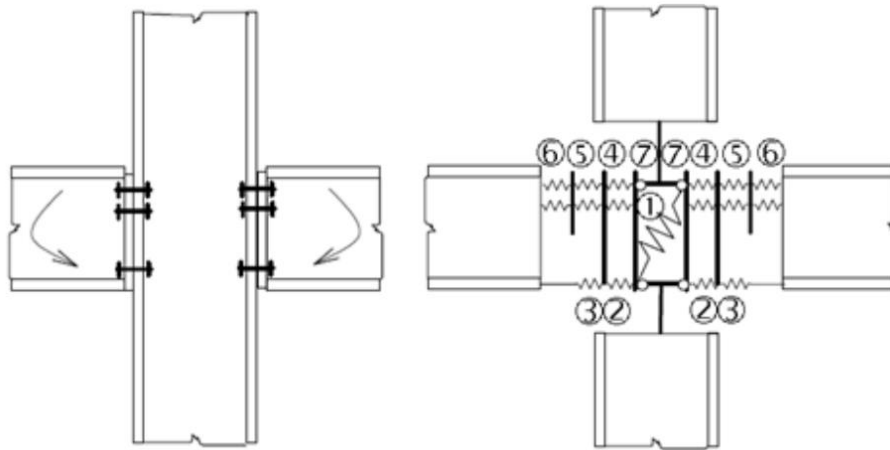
Symmetrical beam-to-column connections with end plates in a component model
